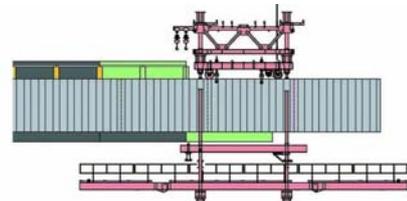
Corrugated steel webs, free cantilever construction, Akabuchi-gawa bridge, (Central-NEXCO and Sumitomo)
